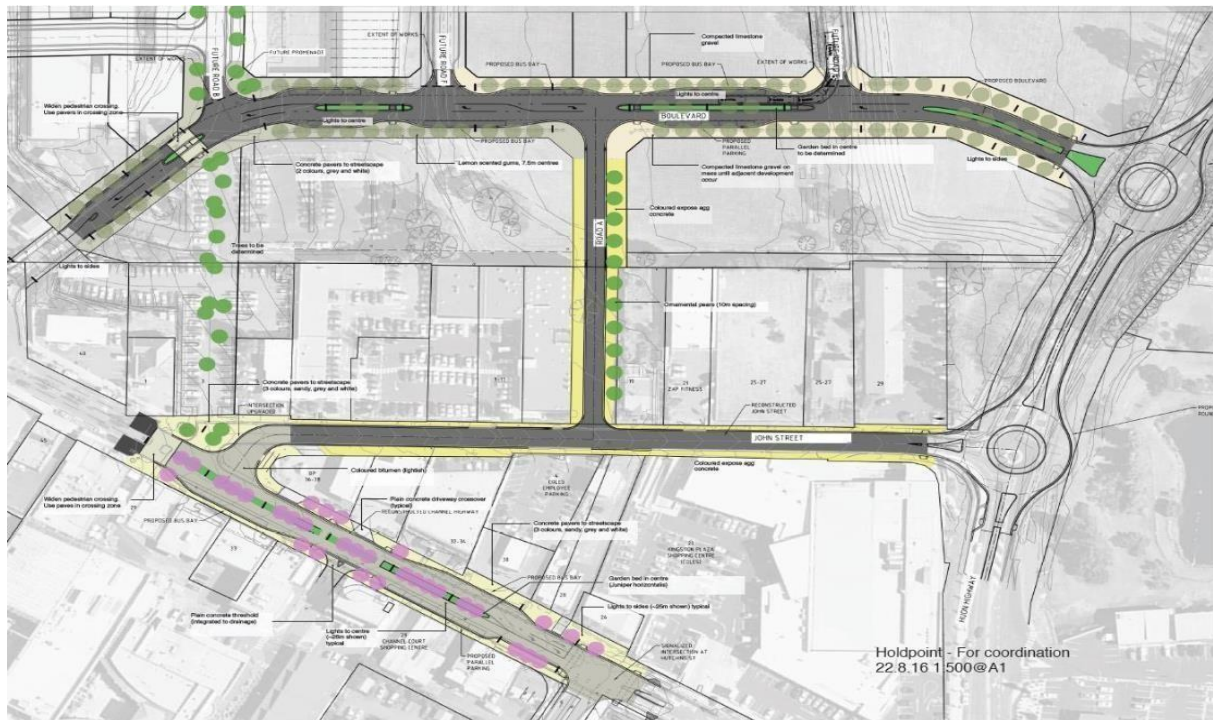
Road construction within Kingston Park and proposed upgrade of Channel Highway
